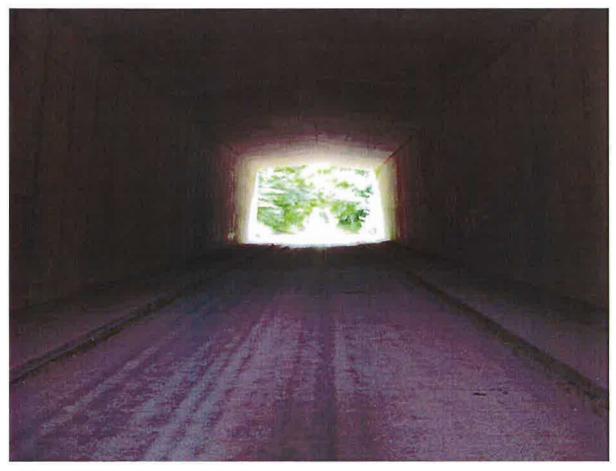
Example of Concrete Box Tunnel (Typical) (Photo Credit/Copyright: Dr. Duncan Pepper¹³)
